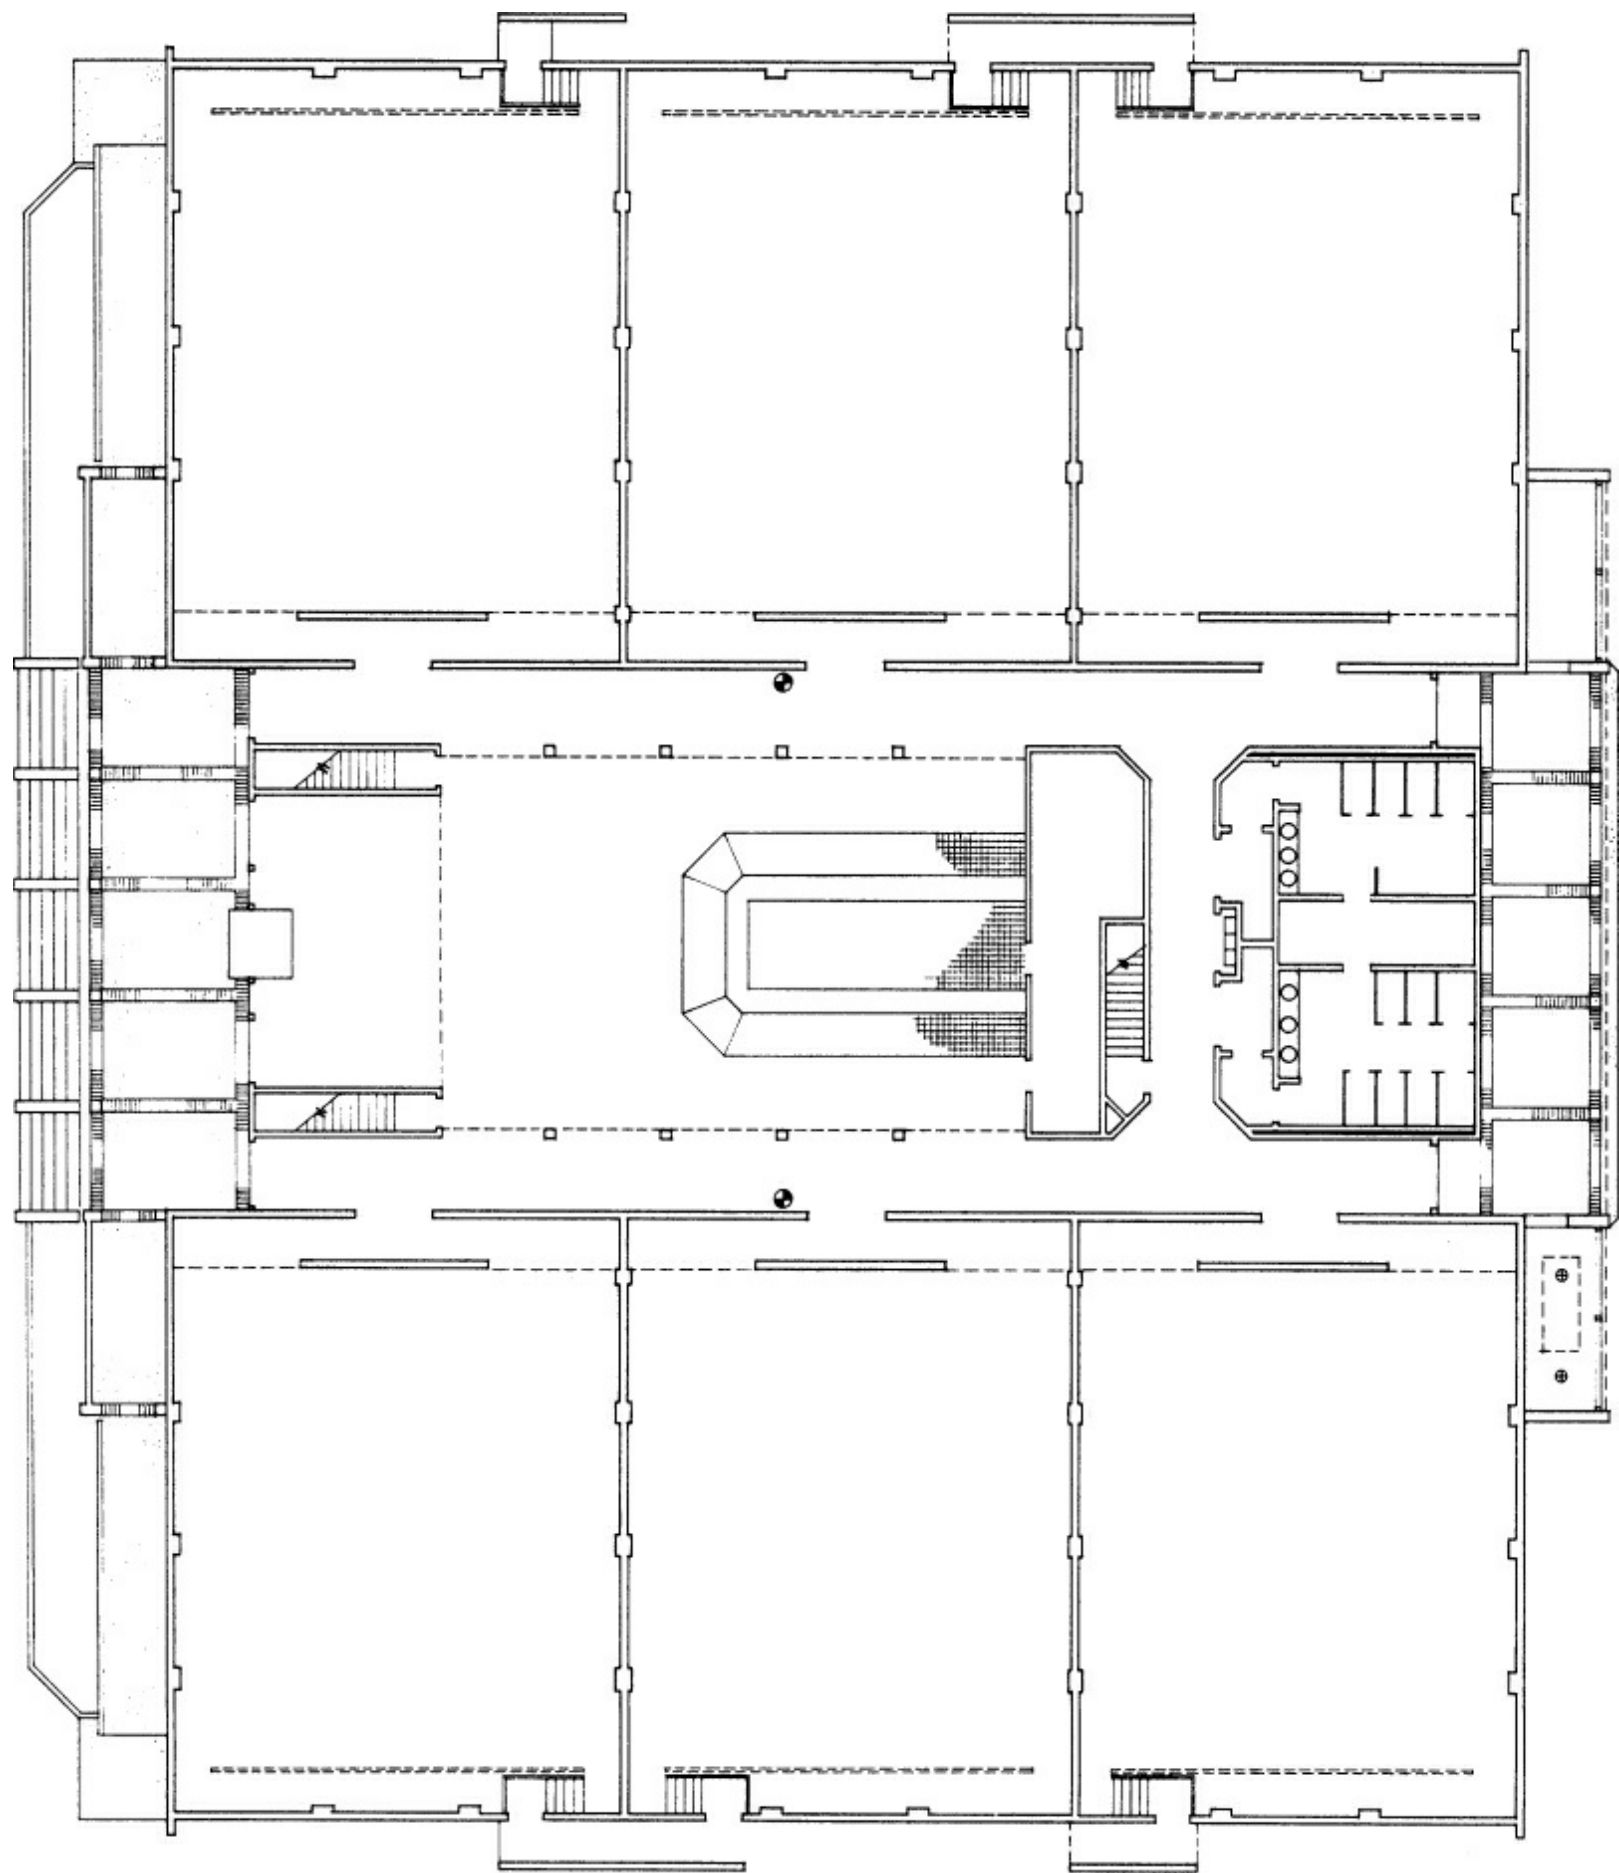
Clay Theater—Stage II: Working drawing—ground...floor plan.
